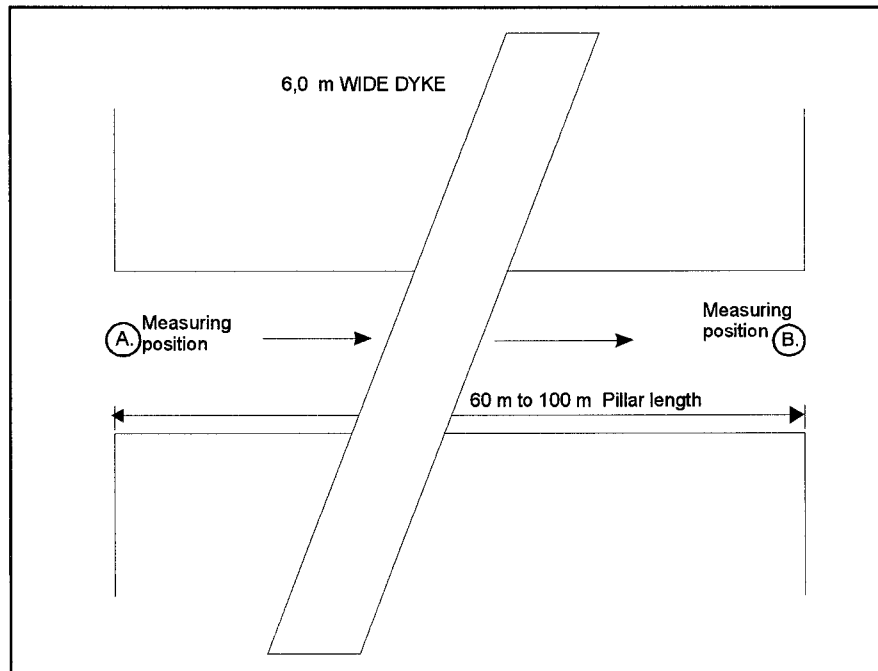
Sketch showing a typical dyke area as developed through a coal pillar
